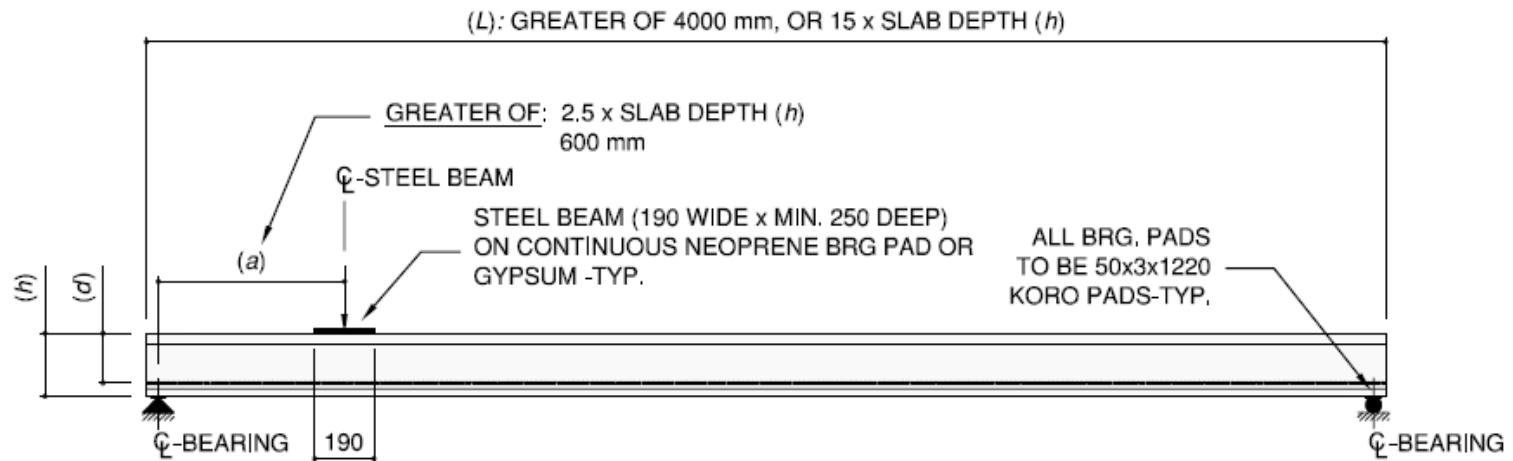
Elevation of Typical Test Set-Up for Full Scale Shear Test
